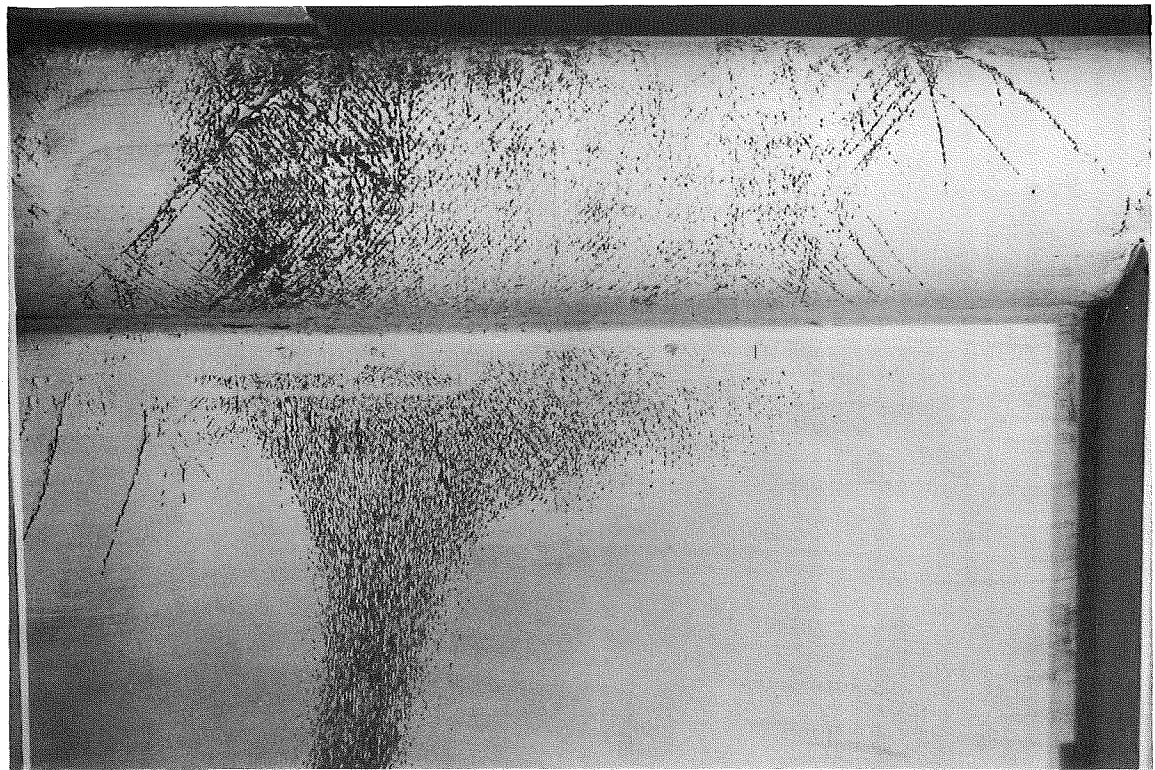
Detail of Failure, Girder E5, Test T2
